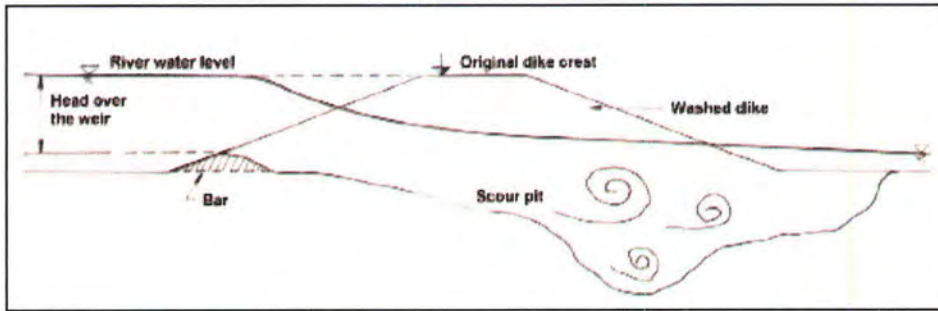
Typical cross section of a levee failure with scour hole (pit) (after Nagy, 2006).
